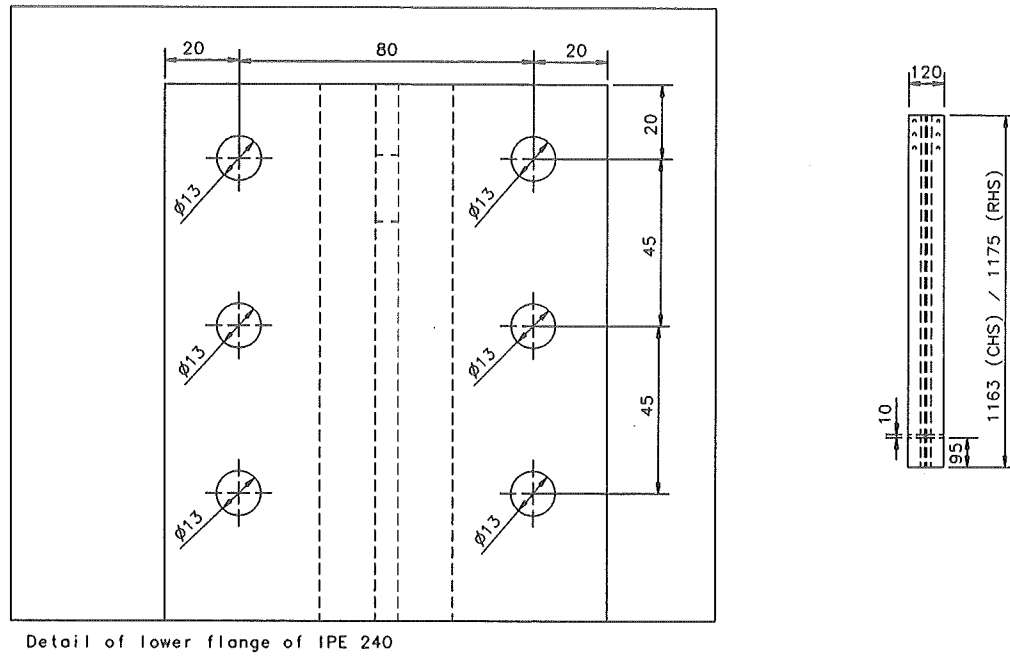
Details of bolt holes in I-beams for specimens 4C1 to 4C4 and 4R1 to 4R4 in plane
